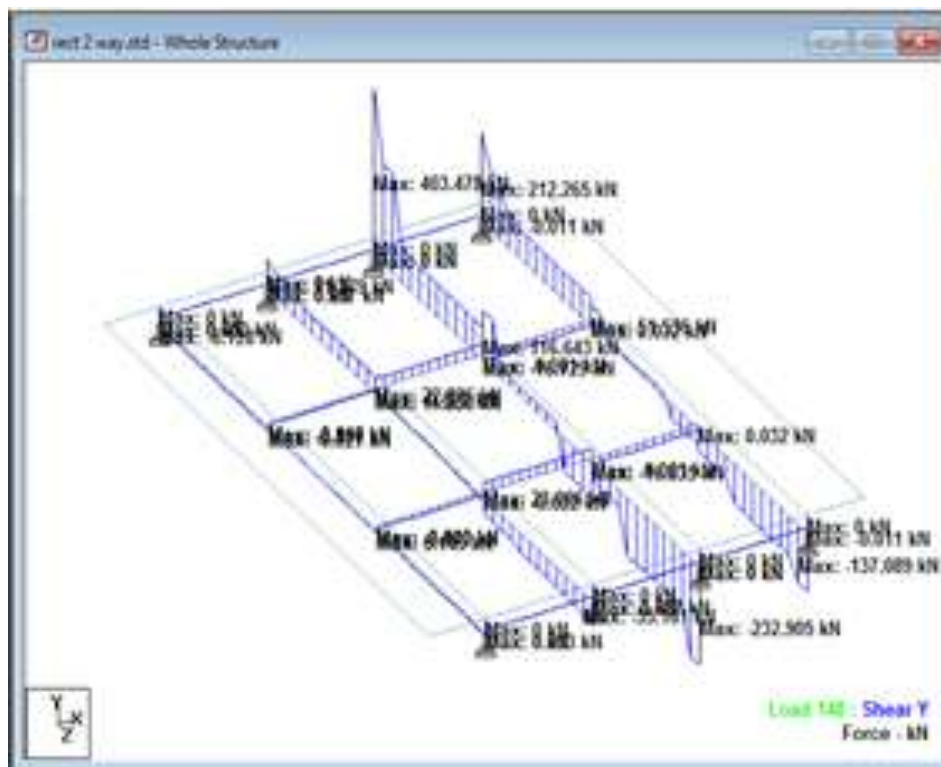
shear of Rectangular girder size 0.5 x 1 m with beam (2 way):
